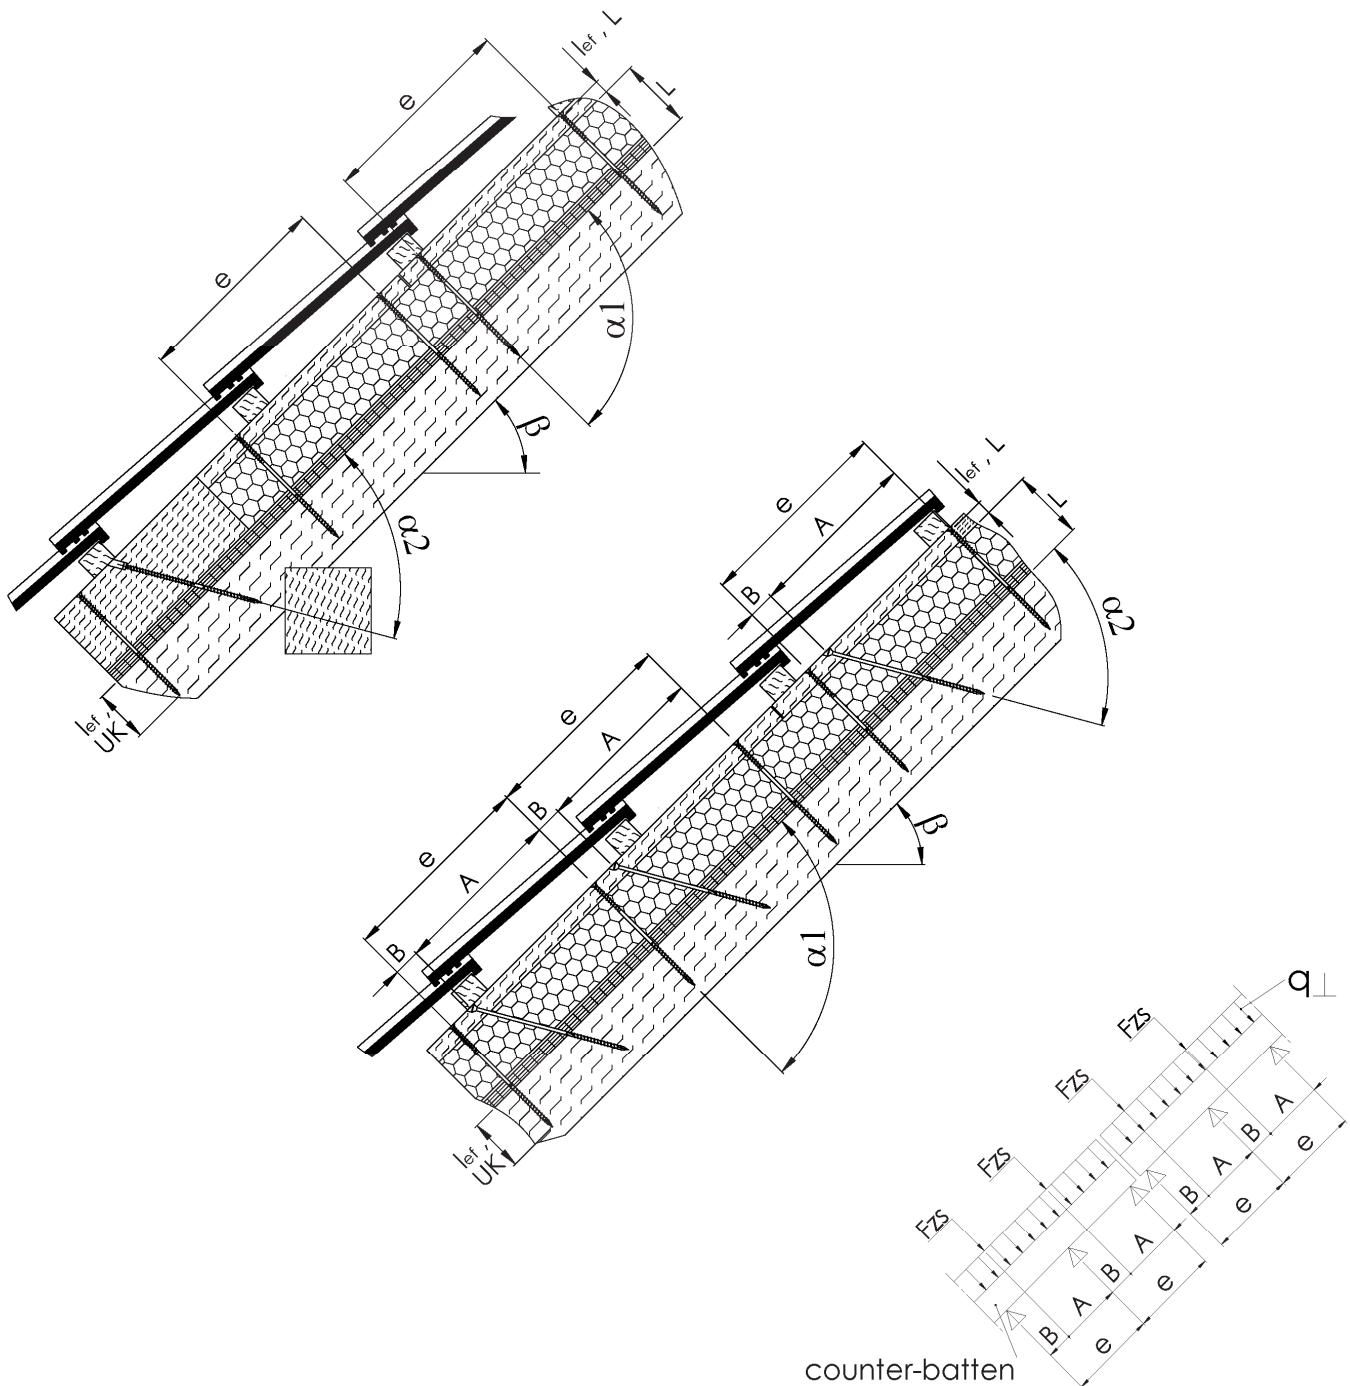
Fastening of thermal insulation material on top of rafters - structural system for alternatively inclined screws and continuous batten under constant line loads from actions on the roof plane  $q_{\perp}$  and concentrated loads from tensile screws  $F_{ZS}$
